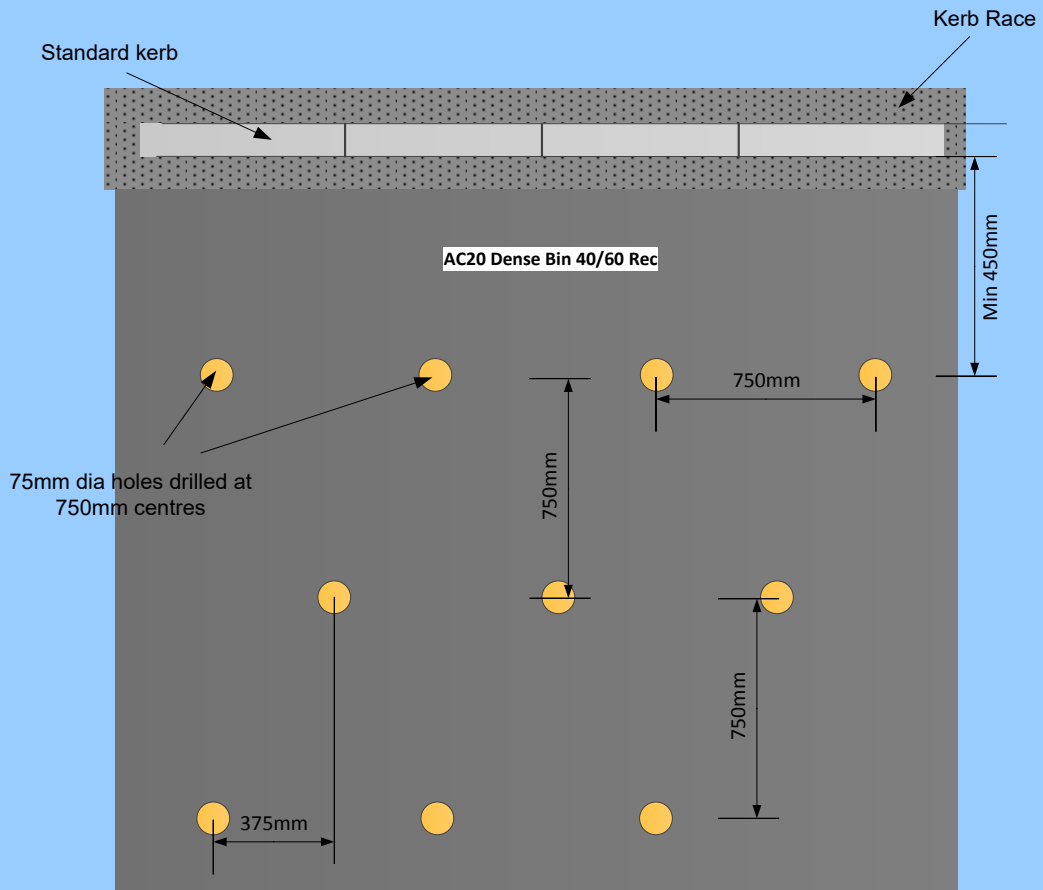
/9 – TYPICAL ROAD SECTION PERVIOUS PAVEMENTS
